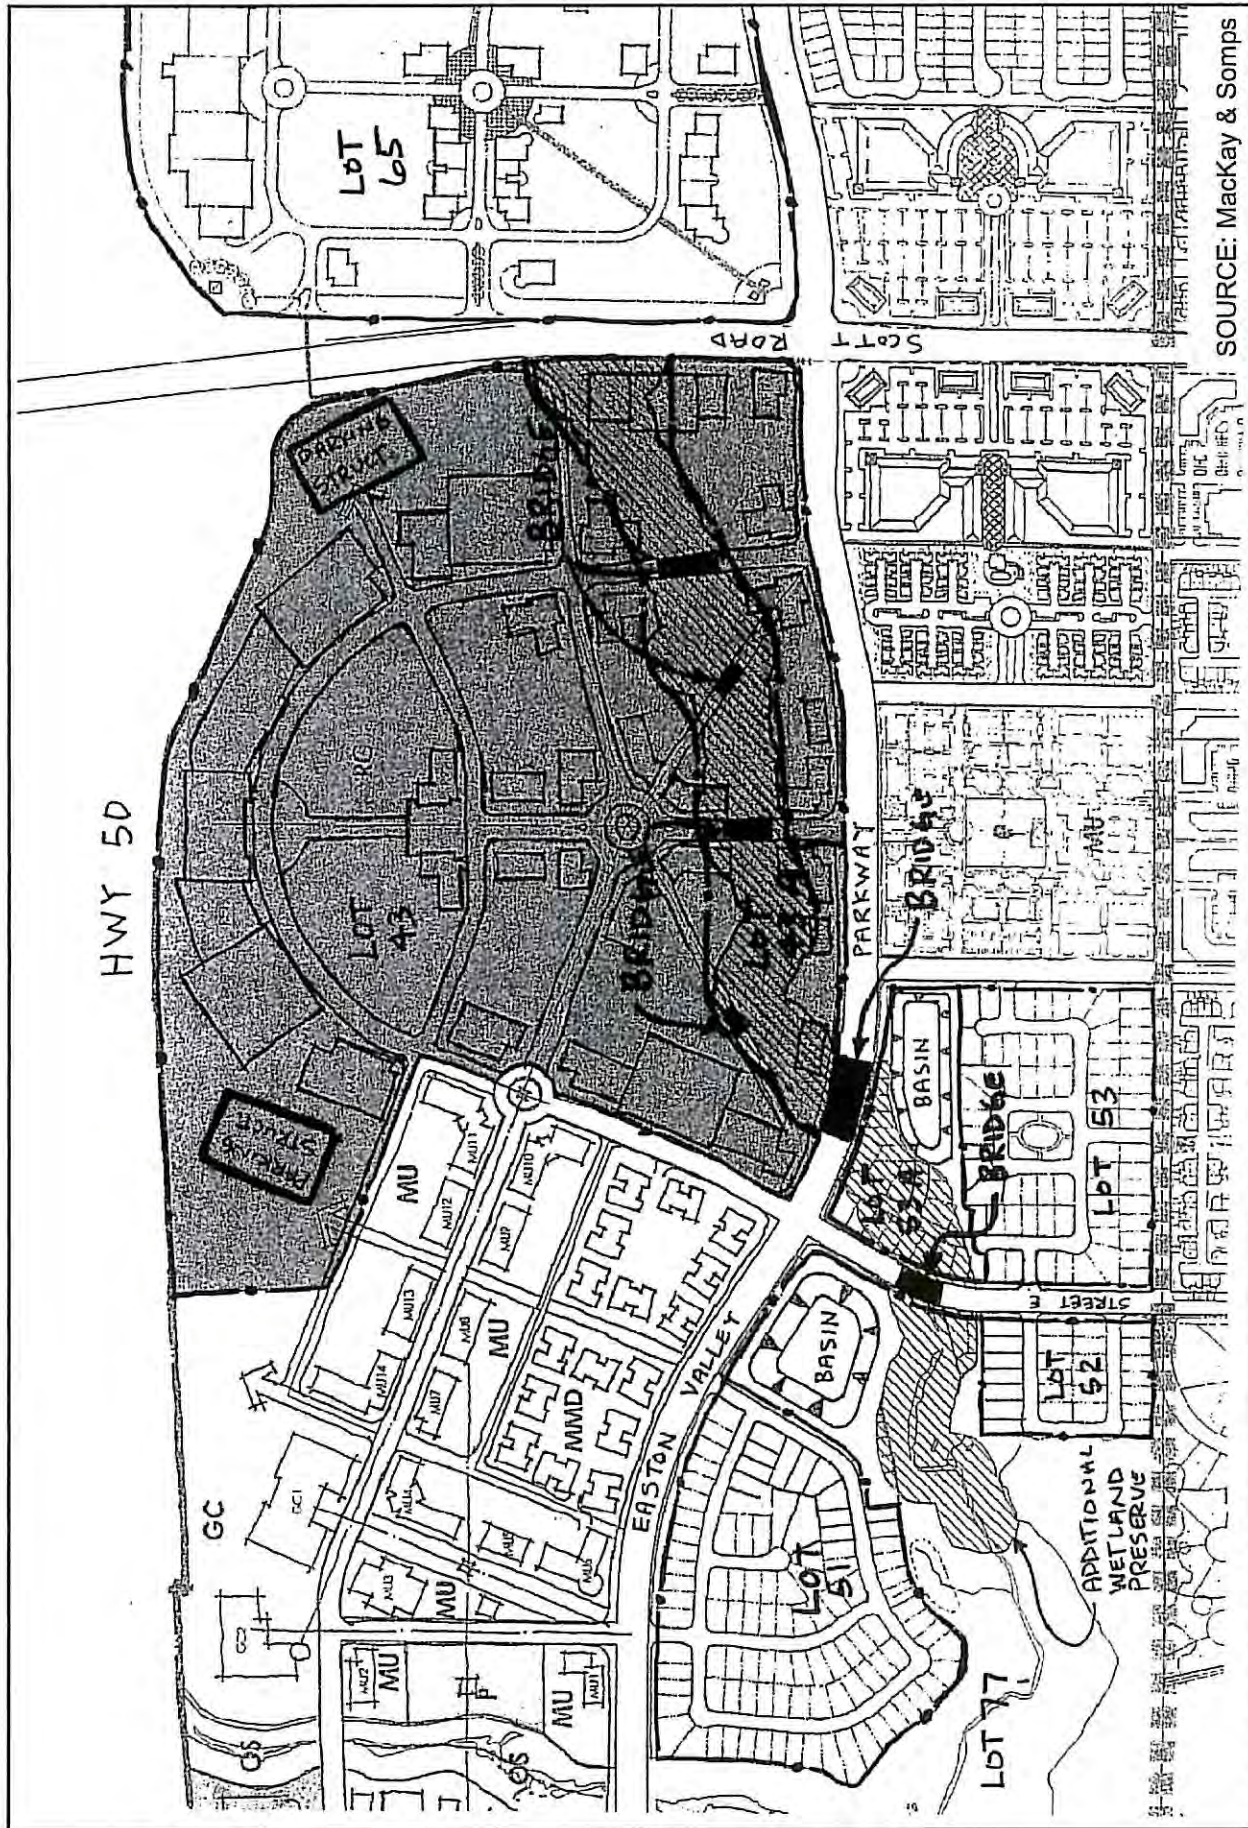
Alternative 5b: Proposed Project with Additional Avoidance of Drainage Through Mall Site to Highway 50 - Detail
